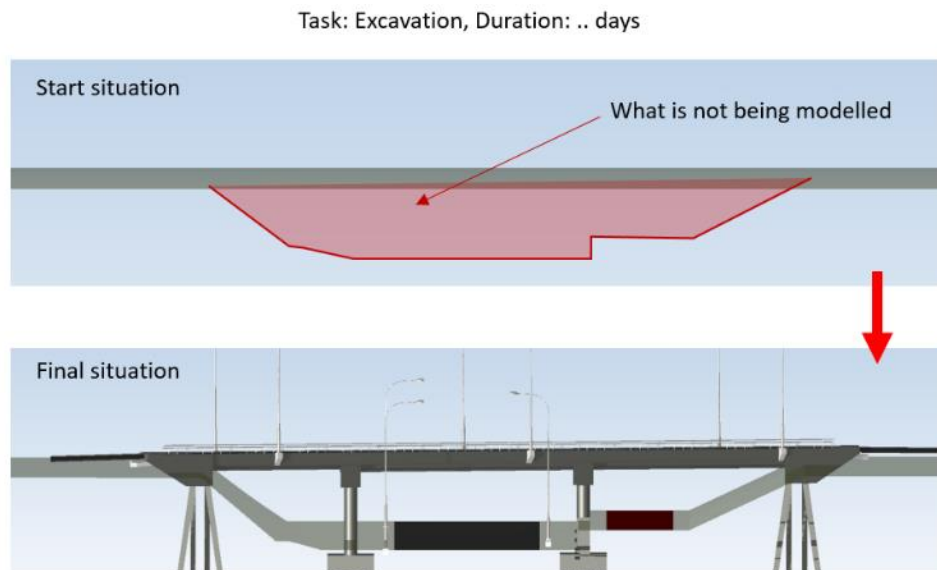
Elements not being modelled - Excavation (from BAM viaduct case)
